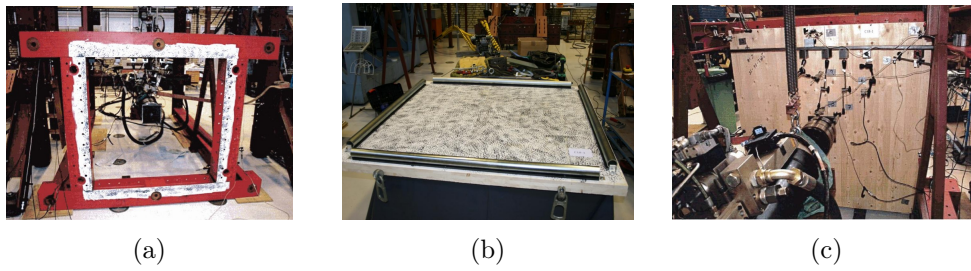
Illustration of the experimental set-up: (a) vertically oriented supporting steel frame with horizontal loading; (b) four pre-assembled tubes as the supporting structure on loaded front surface of CLT plates; (c) hydraulic punch device as the concentrated loading on the center of loaded back surface (Hochreiner et al., 2014).
